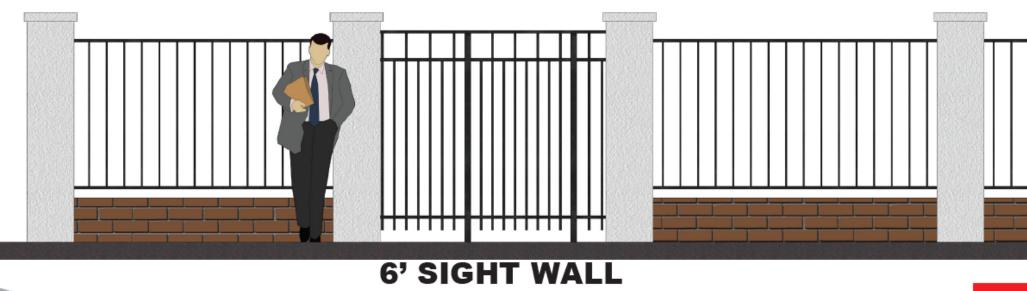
CONCEPTUAL SITE WALL & TRASH ENCLOSURE
